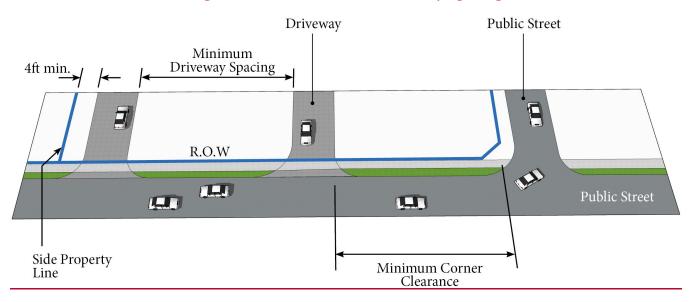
TYPE A & TYPE B DRIVEWAY SPACING
